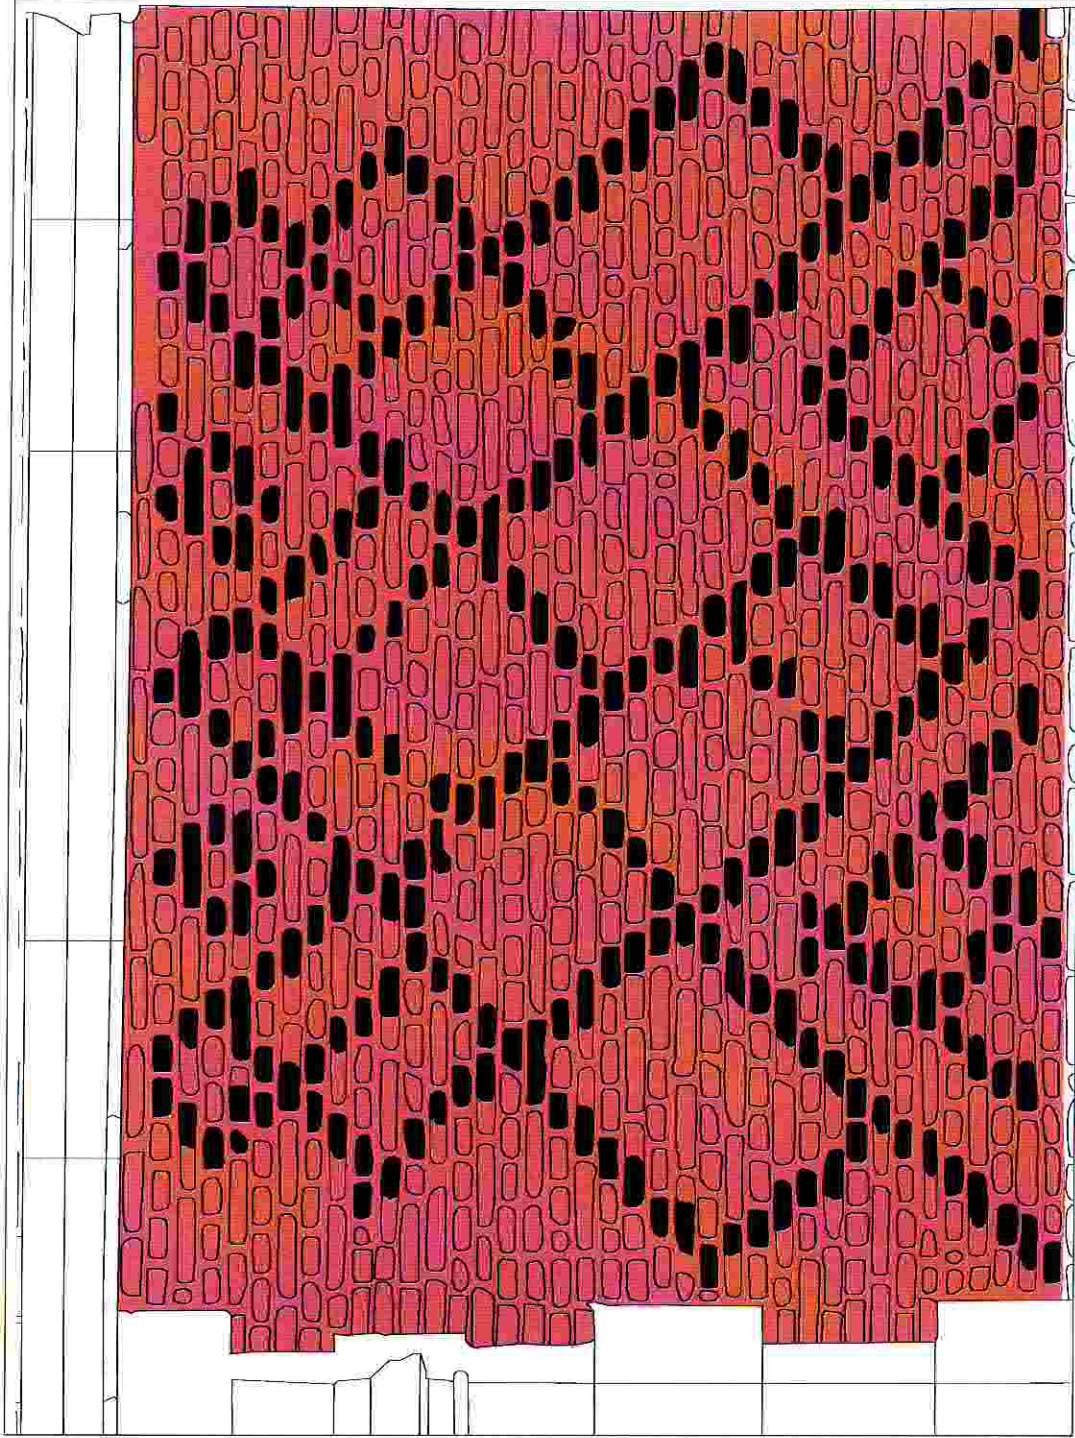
Chapel Court, North Facing Elevation - Reconstruction of possible Victorian diaperwork design on the test panel
